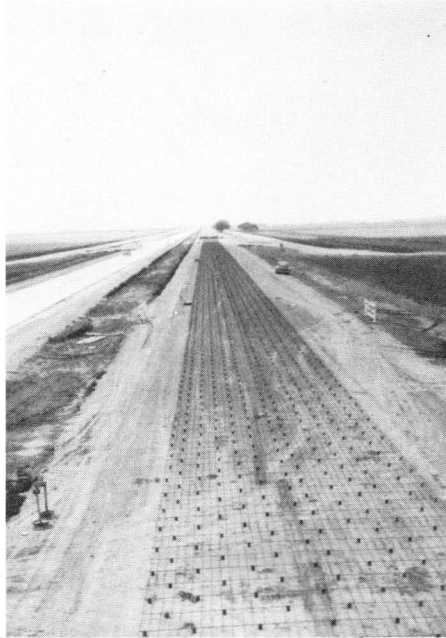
DEFORMED BAR CONTINUOUS REINFORCING STEEL IN PLACE ON 4-INCH BASE COURSE OF HOT-MIX ASPHALTIC CONCRETE LEVEL-UP. STEEL MAT FABRICATING EQUIPMENT CAN BE SEEN IN THE DISTANCE.
